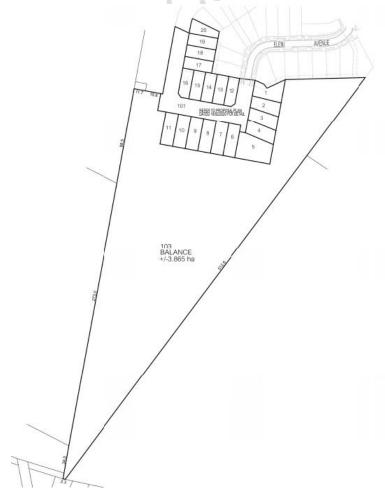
Proposed subdivision layout showing the 20 lots and balance
